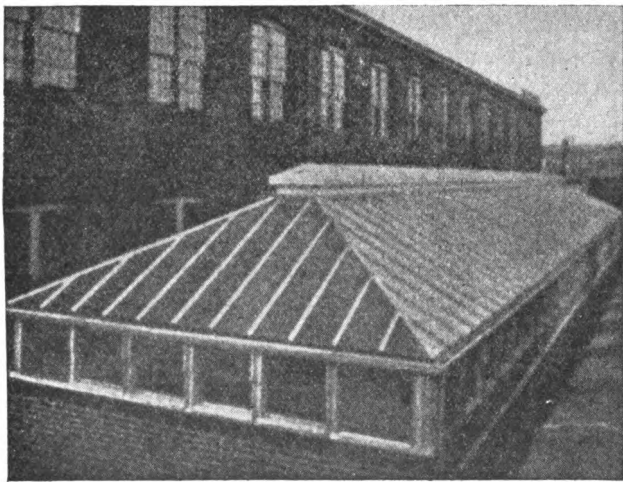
B.—Large Skylight Over Low Building, and Metal Windows in Taller Building Provide Natural Light for the Interiors
